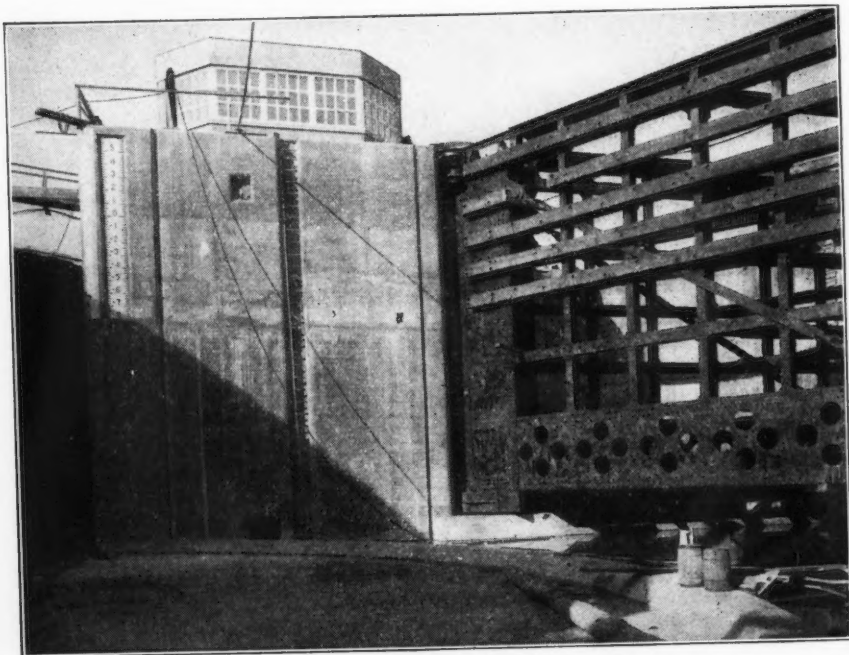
VIEW FROM SILL OF WEST GATE FOUNDATION STRUCTURE
